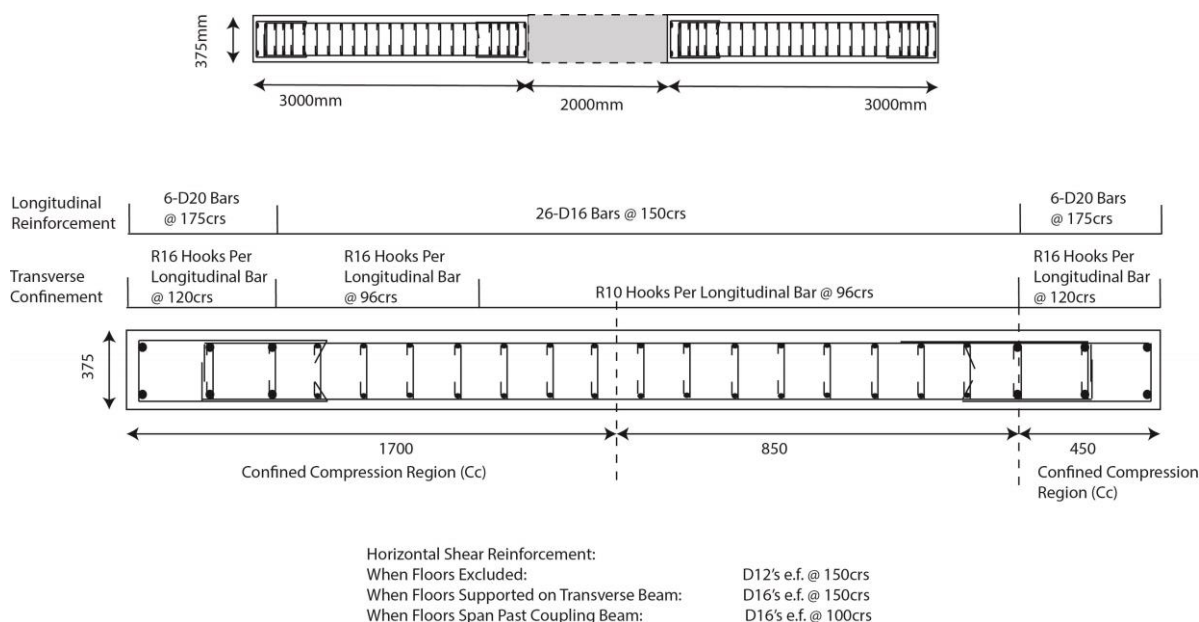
Coupled Wall 3 (CW 3) wall pier design
